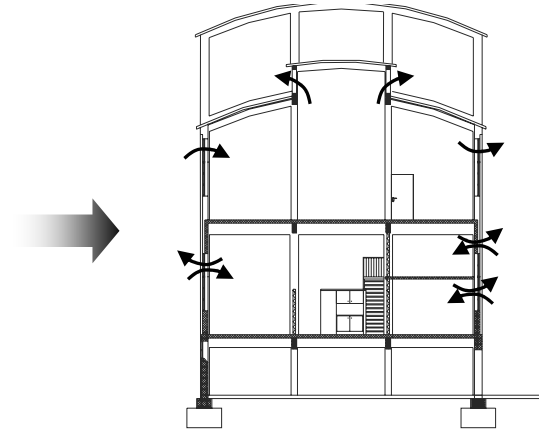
Typical ventilation principles of natural ventilation in Volvo: single-sided, cross and stack ventilation.
